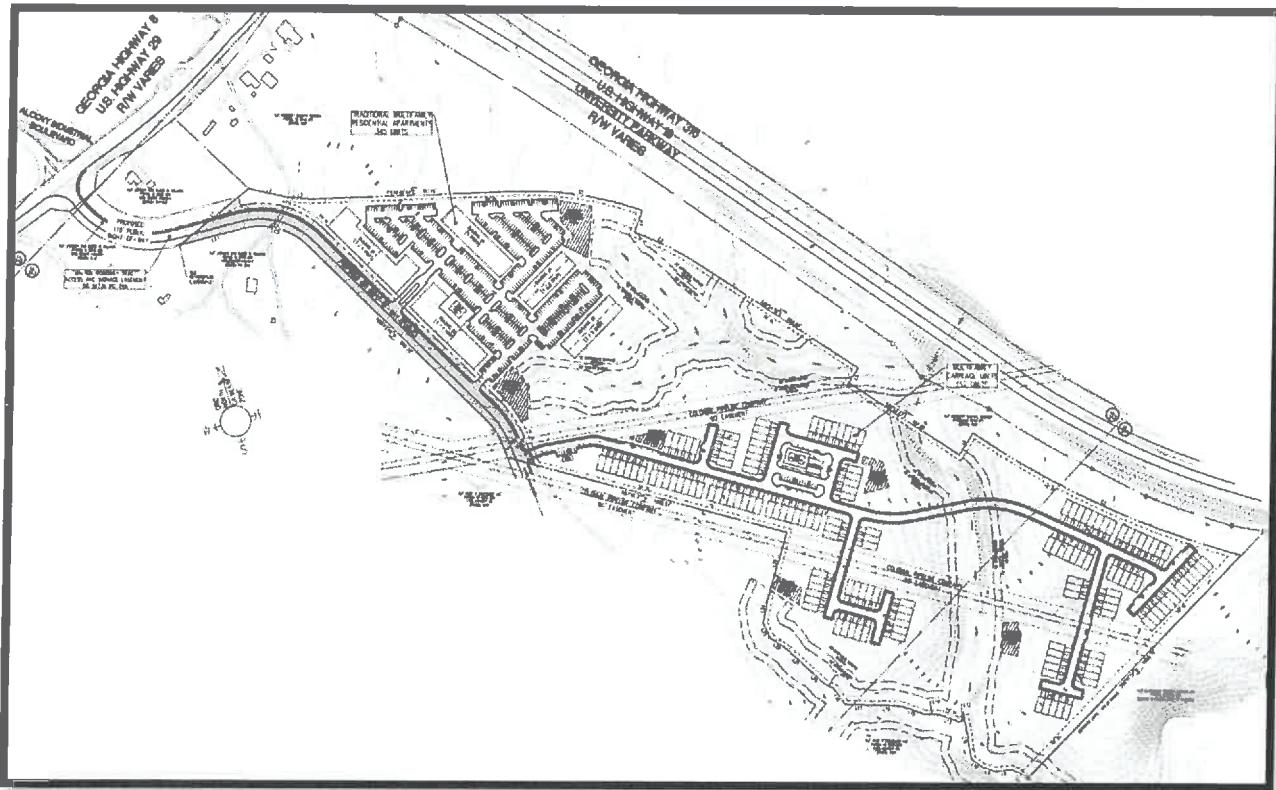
Site Plan for Proposed Sugarloaf Crossing Subdivision
